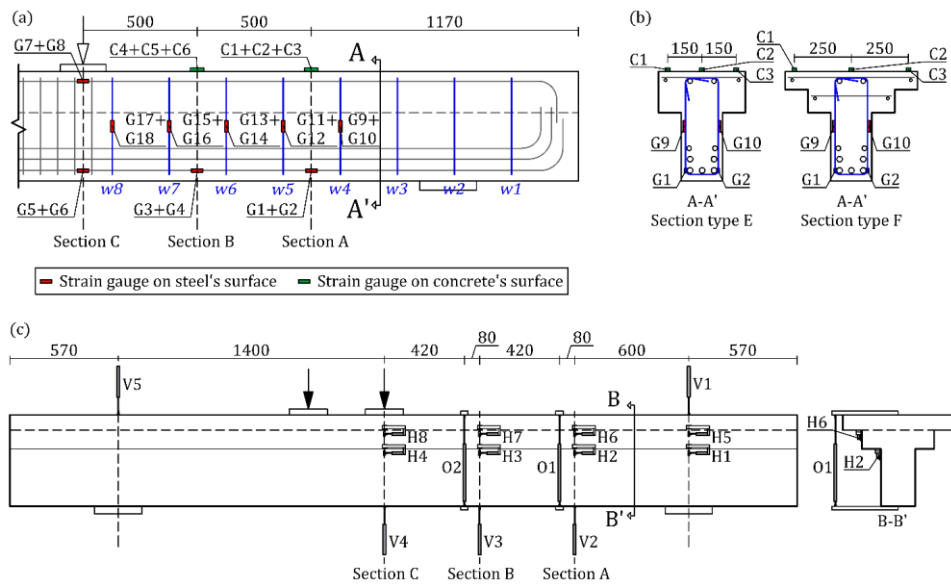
Tests instrumentation: (a) strain gauges at the principal span; (b) strain gauges at section A-A' for beams types E and F; (c) LVDTs (dimensions: mm).
